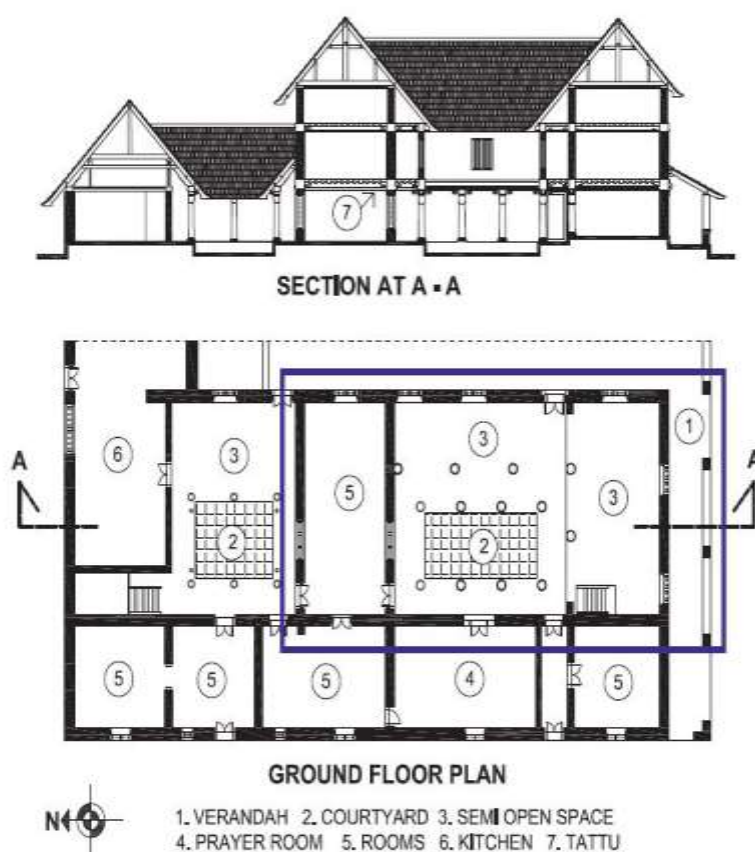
Plan and section view of traditional architecture (Dili et al., 2011)
